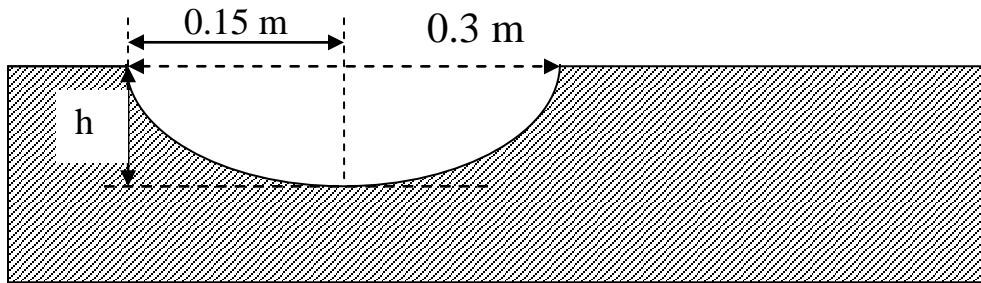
Profile of Asphalt Concrete Pavement with One Pothole
